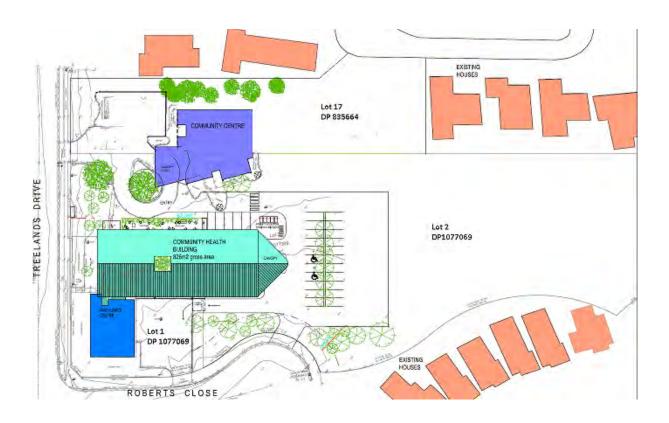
Proposed new Community Health Building location and layout (source: adapted from Granatelli & Stone)
